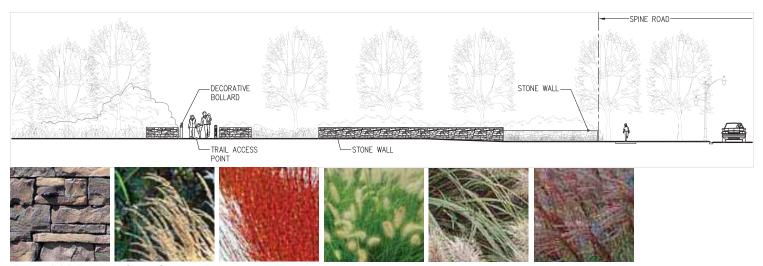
Dry-Laid Stone Gateway Elevation and Materials Palette
